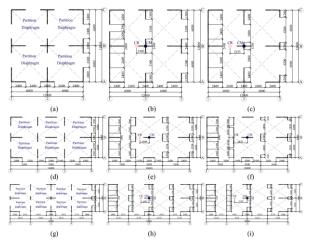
Three groups of single-storey baseline houses with different bracing wall layouts [68].
